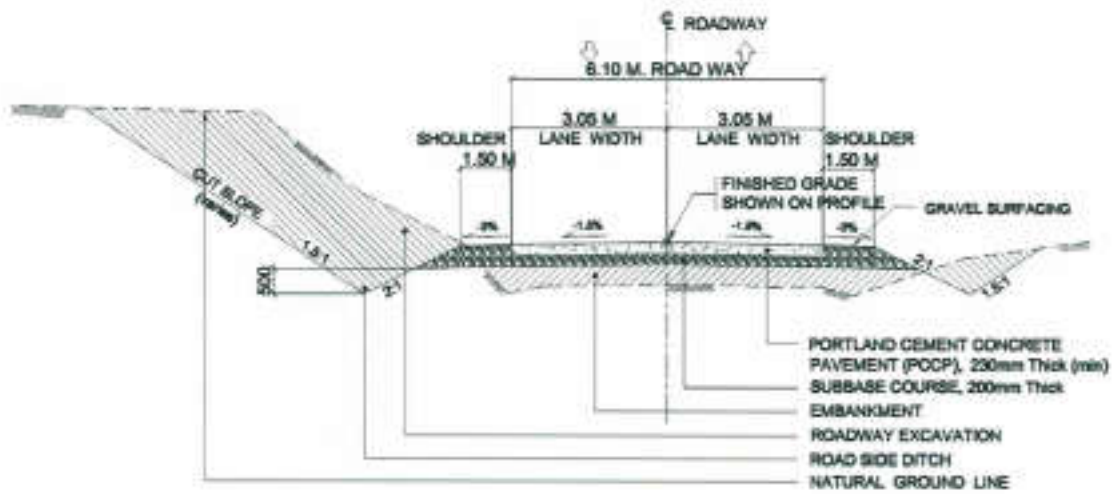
TYPICAL ROADWAY CROSS-SECTION FOR EXISTING ROADS
